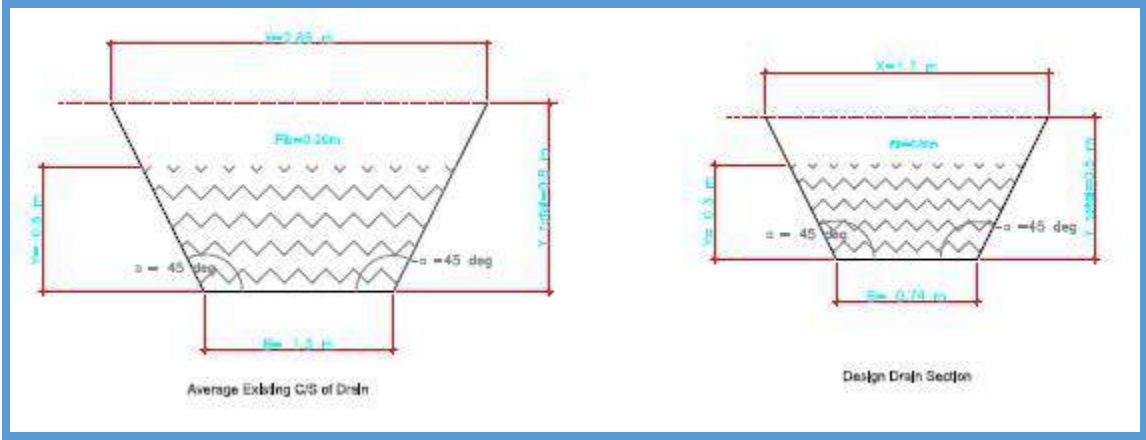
Typical Drain Cross Section for Providence Roadside Earthen Drains
